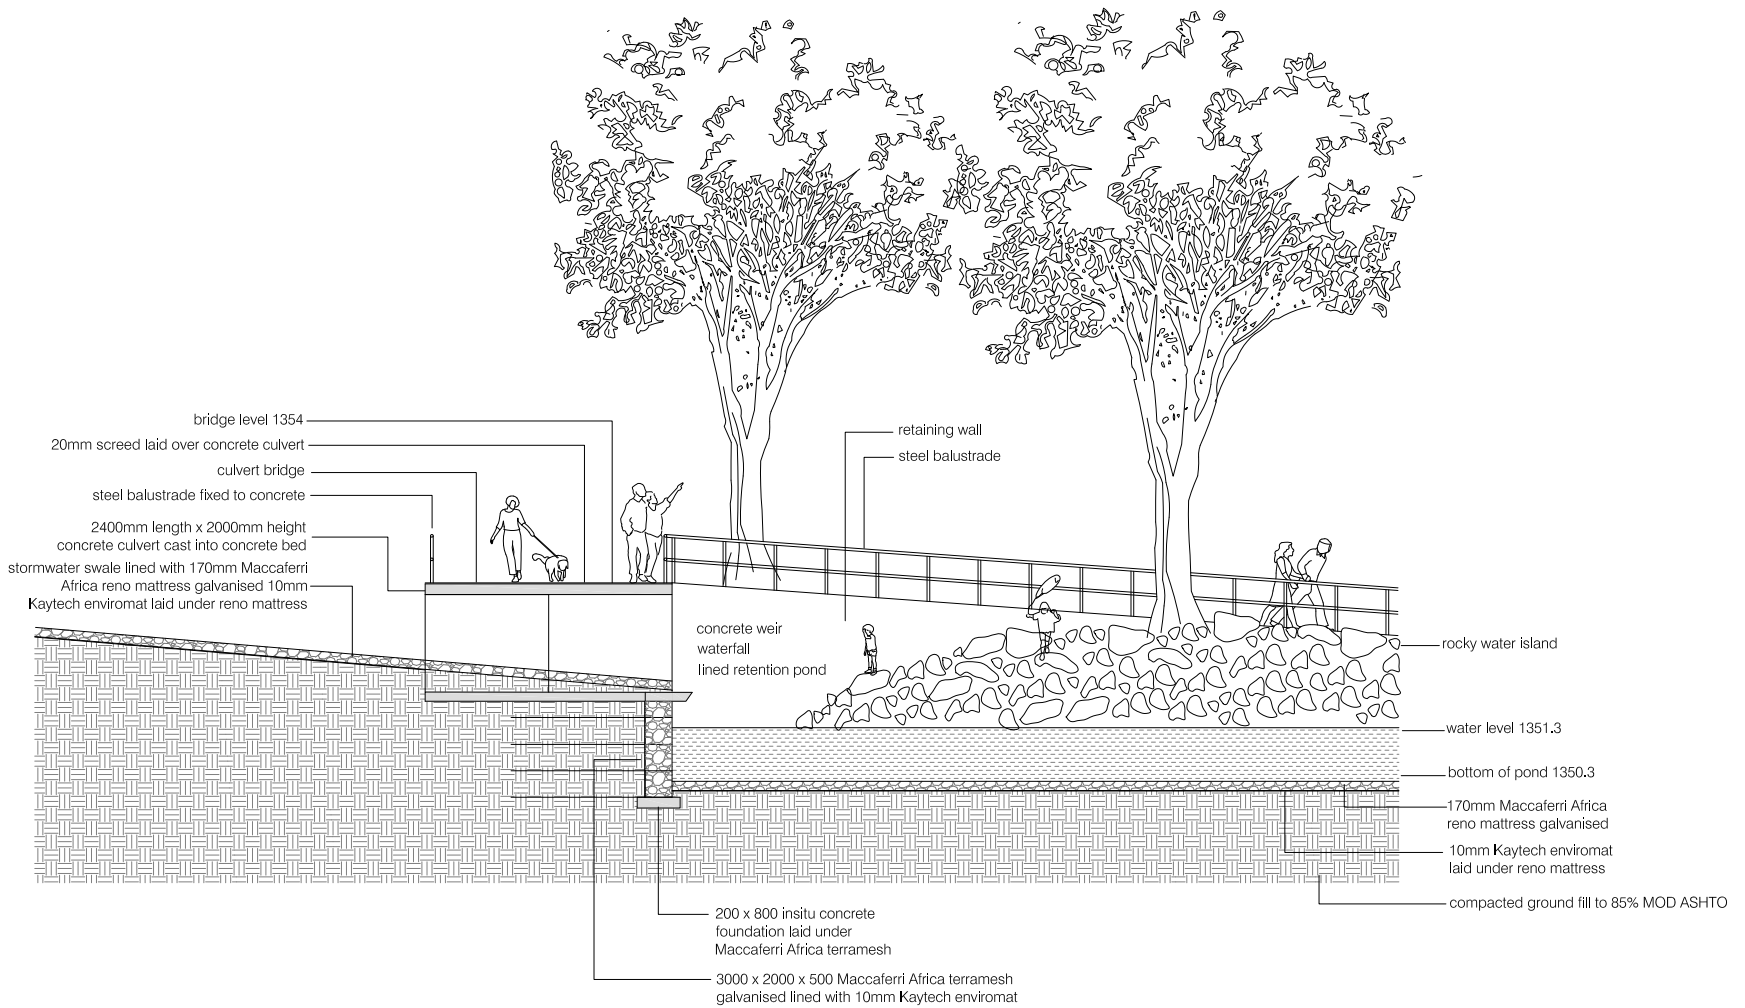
Waterfall bridge. Section elevation E. Not to scale
